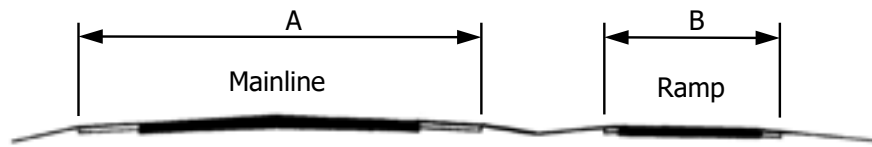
Approach roadway cross-section view for a mainline and a ramp that are carried across one bridge.
